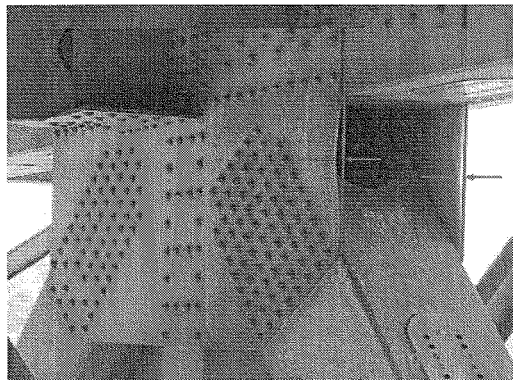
DAMAGED GUSSET PLATE “(U-10)”
